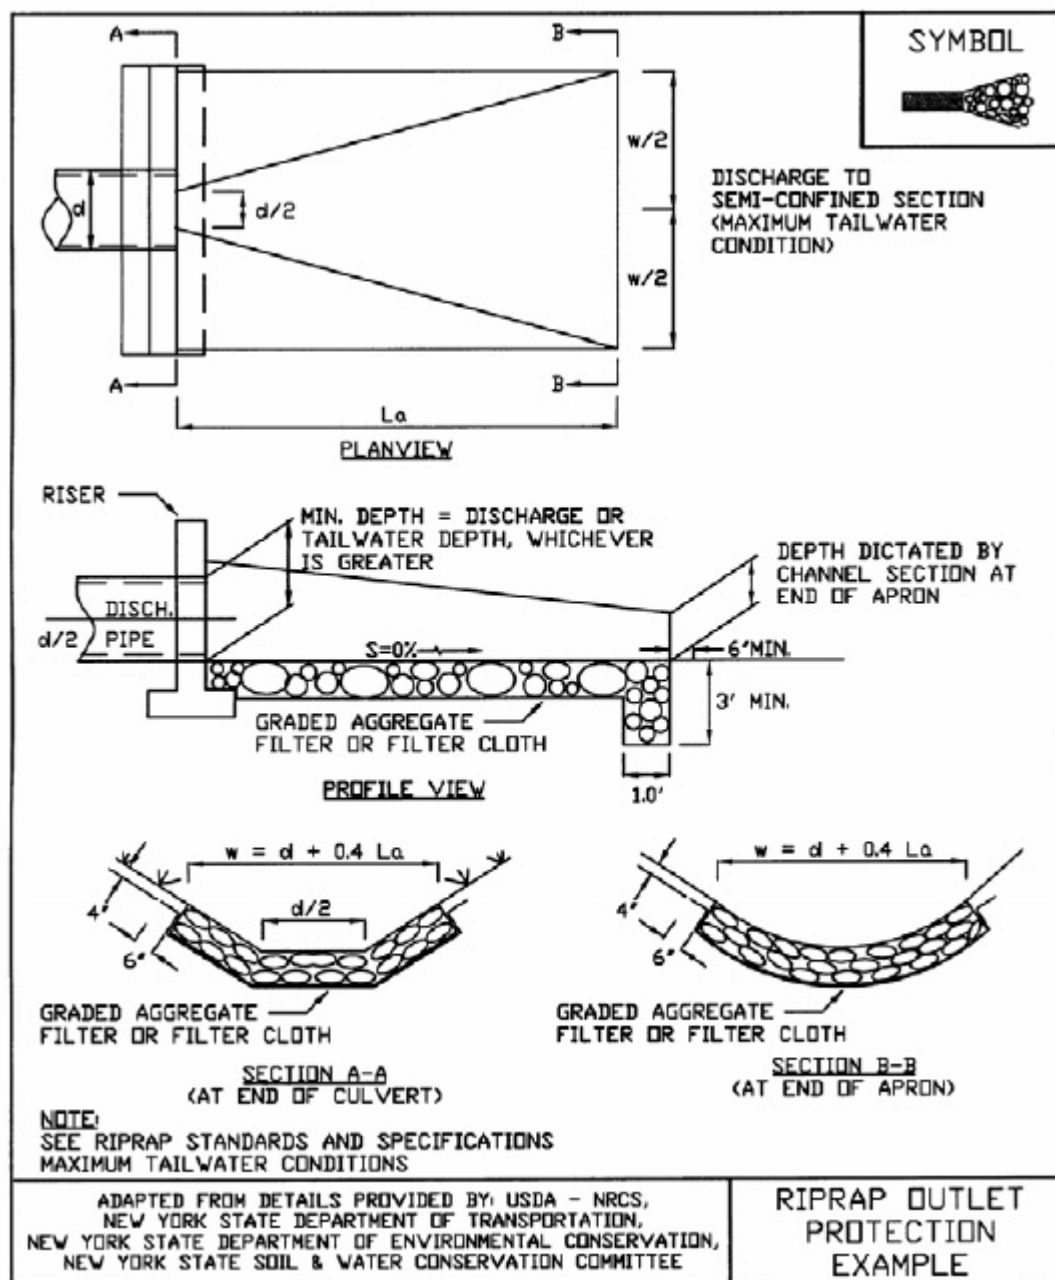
Riprap Outlet Protection: Discharge to Semi-confined Section
